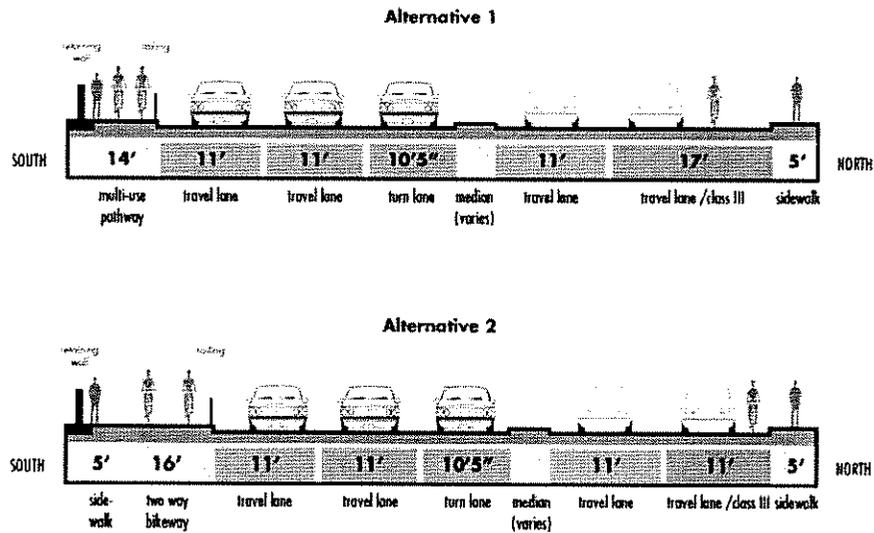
Section of Proposed Improvements for Project 12: Second Street (Section C: West of G Street Intersection) (Medium-Term Improvement)
